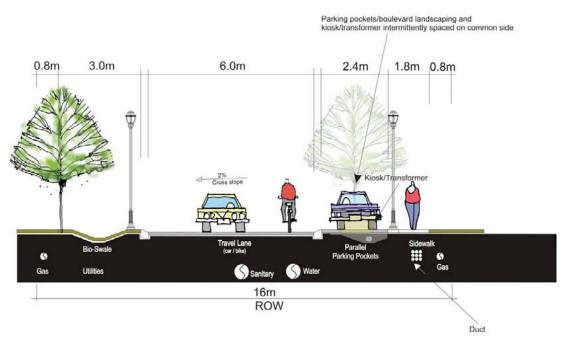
Internal Roadway Cross-Sections - Collector (Neighbourhood Roads) Option
